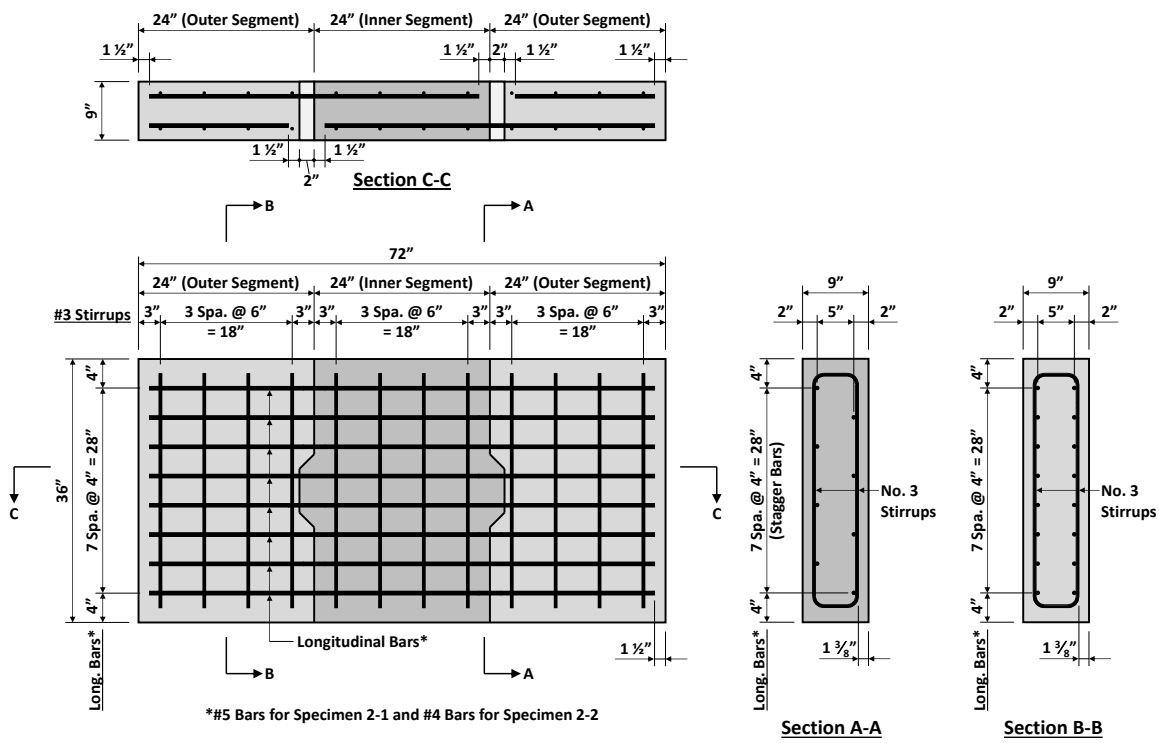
Reinforcement details of Specimens 2-1 and 2-2
